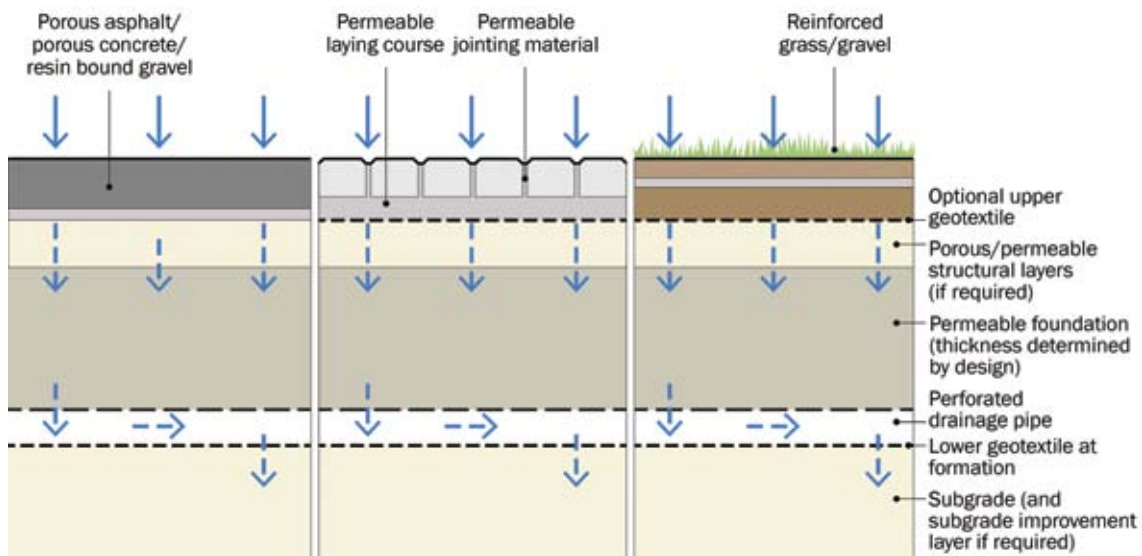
Pervious pavement system types: Type B – partial infiltration
